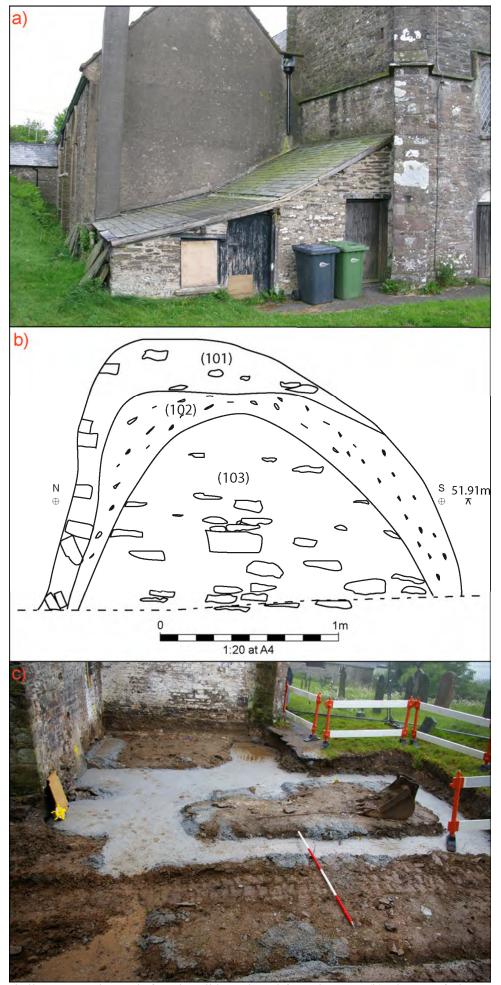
(a) The boiler room and store before demolition, viewed from the west. (b) The west facing section through the hedge bank, and (c) the excavated area of the building footings, viewed from the north (2m scale).
